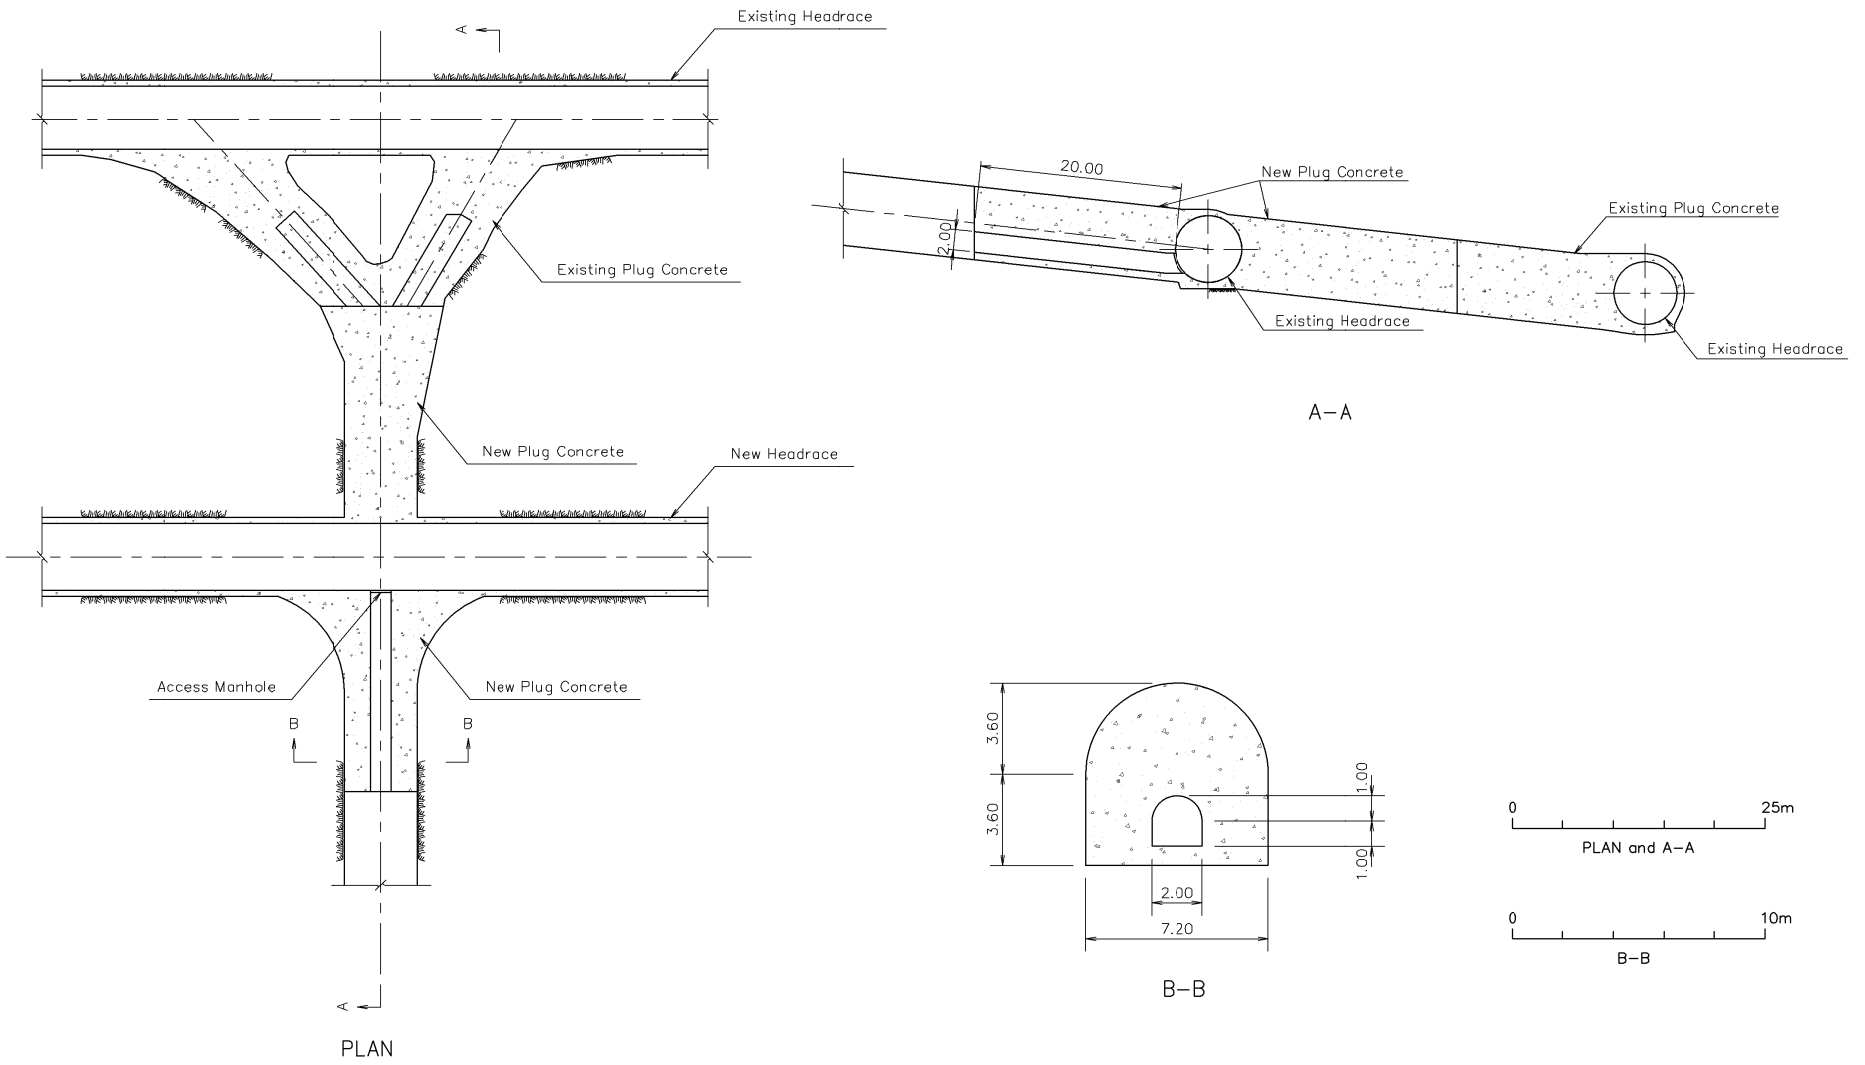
Access Adit Plug Concrete Plan and Section
